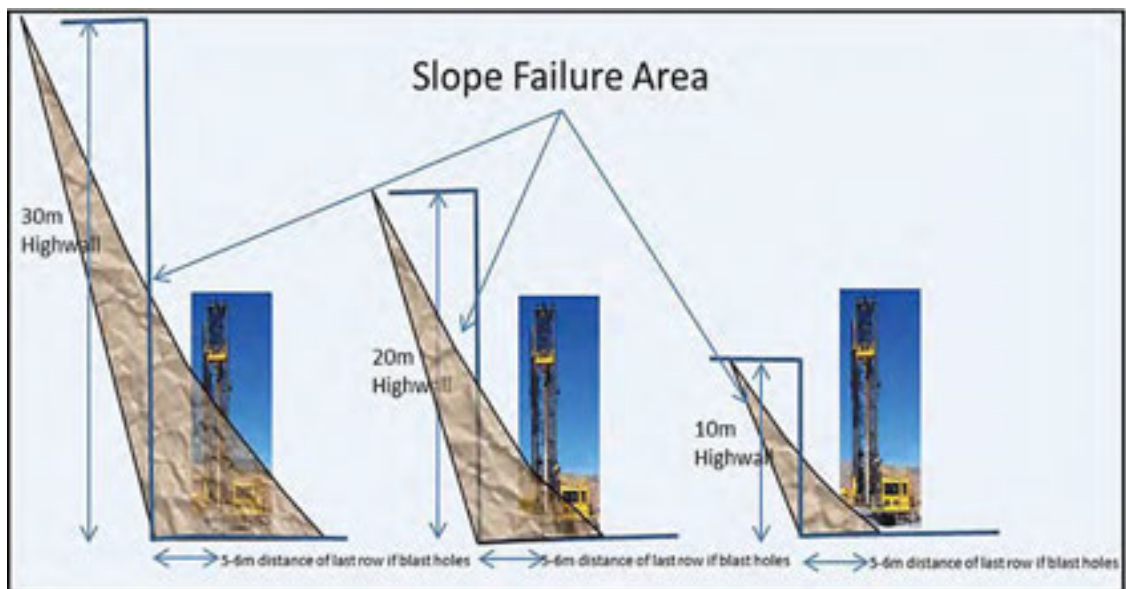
Slope Failure Impact Area for different High Wall Heights
